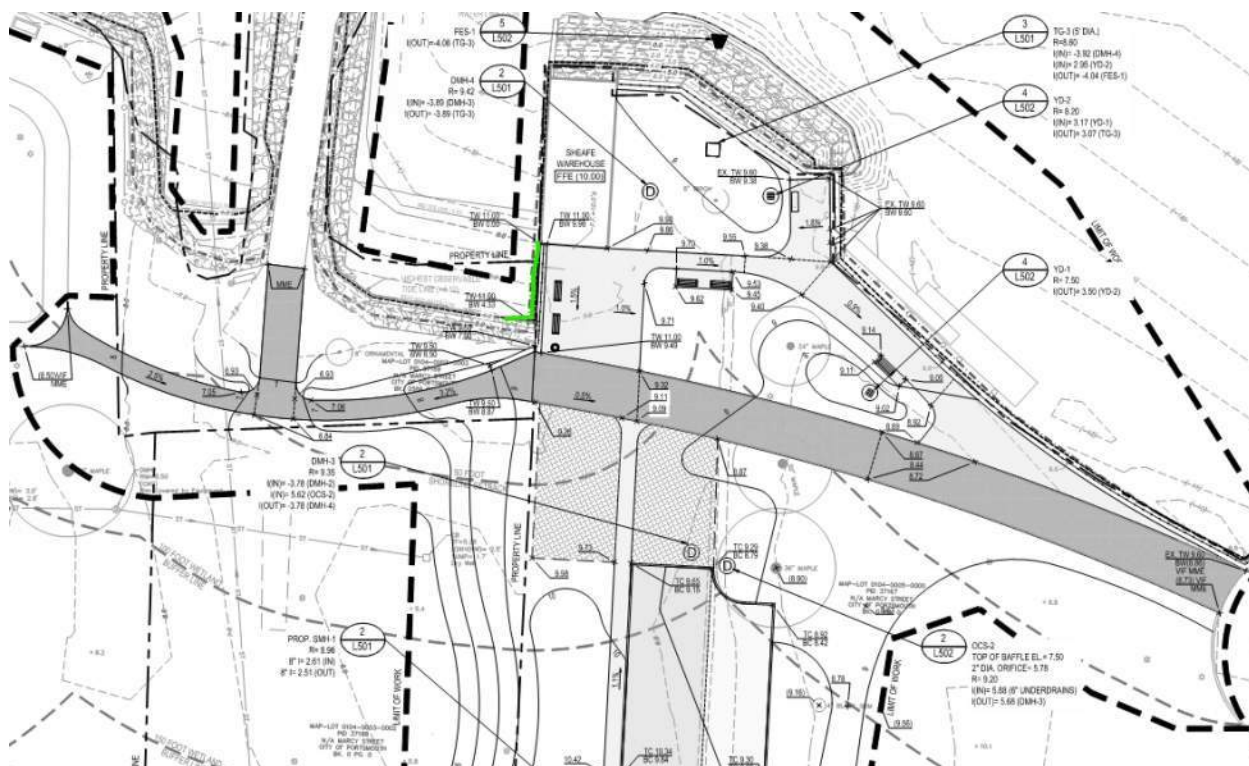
Proposed Vertical Wall Extension From Plan Sheet L140
